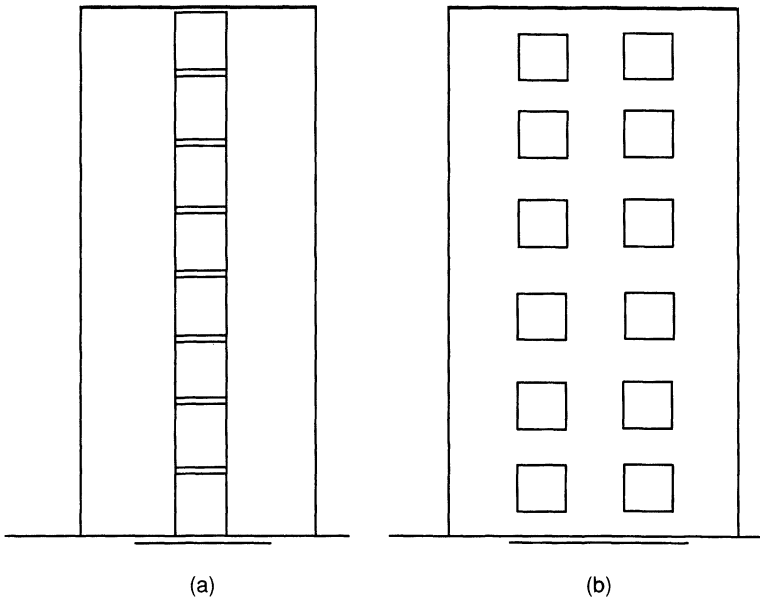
Coupled shear walls: (a) interconnection by floor slabs – ductility provided by flexural yielding of reinforcement distributed across width of walls; (b) interconnection by spandrel walls – ductile yielding of spandrels or columns in lower storeys
